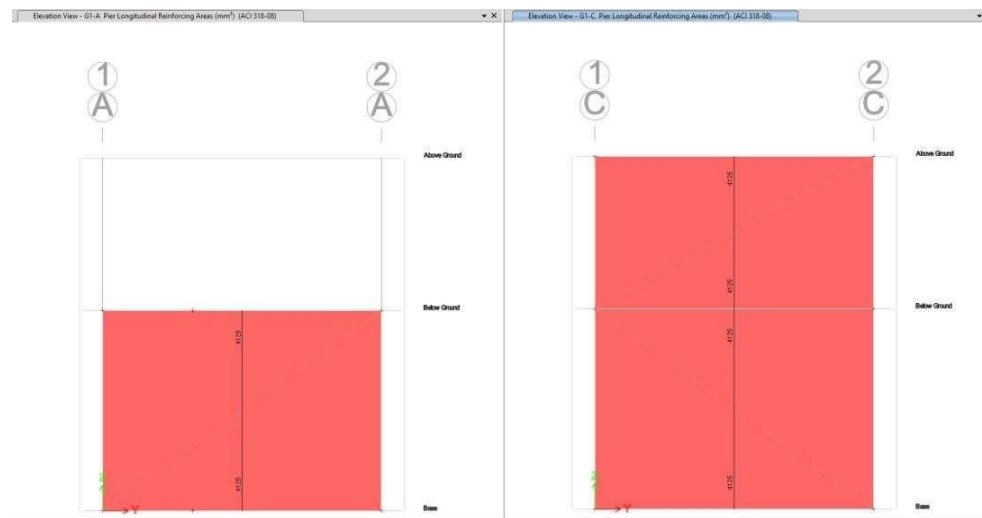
Pier Longitudinal Reinforcing Detail (mm²)
